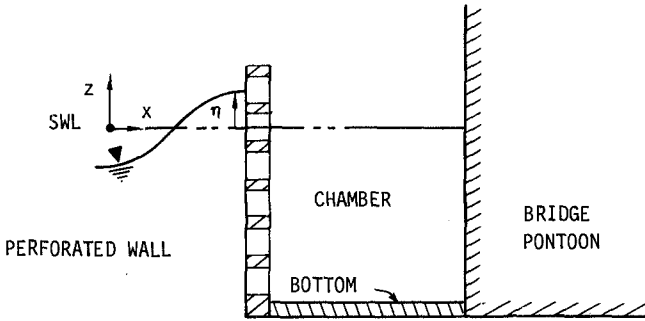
CROSS SECTION OF PERFORATED WALL BREAKWATER
